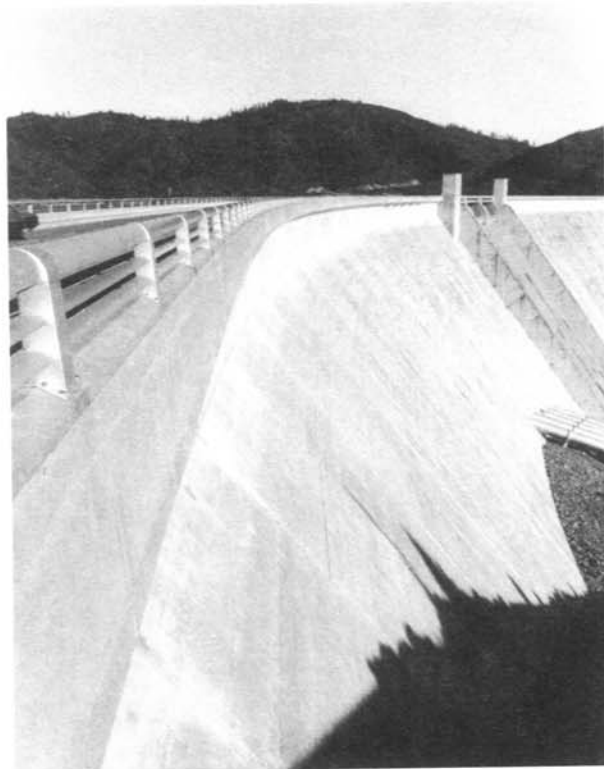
Closeup view of downstream face of Shasta Dam - 2/17/70
